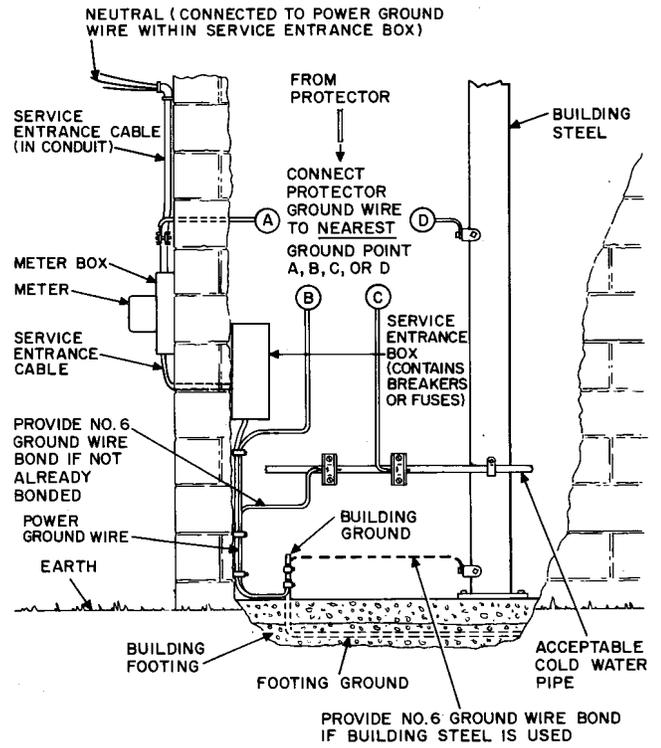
Acceptable Water System or Building Ground—Power Service Grounded to Building Ground
